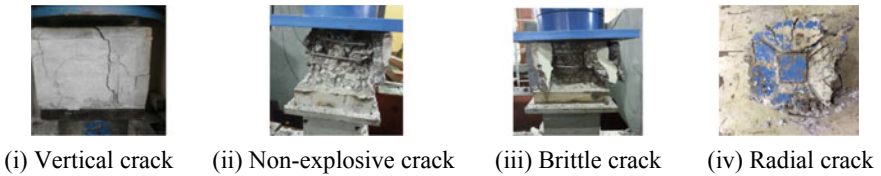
Modes of failures for reinforced concrete blocks concentrically loaded through 50 mm × 50 mm square steel plates
